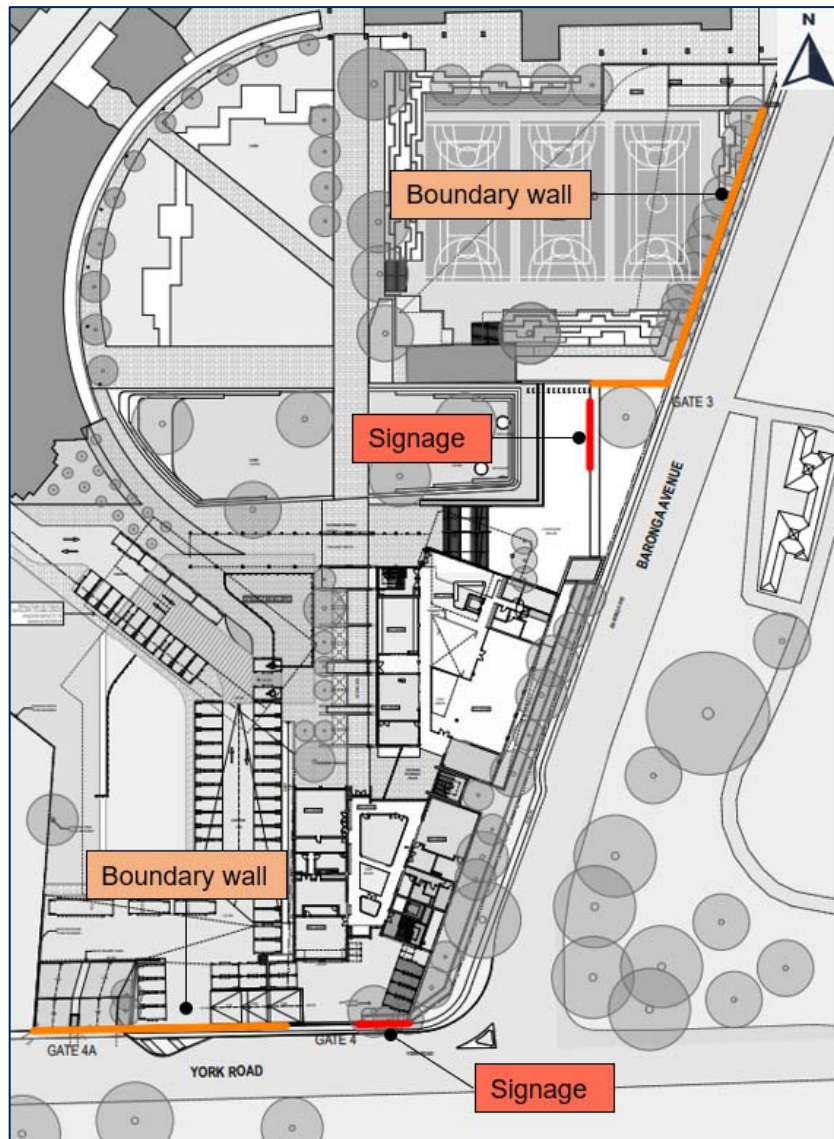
| Proposed signage and boundary walls (Source: Applicant's SRtS)
